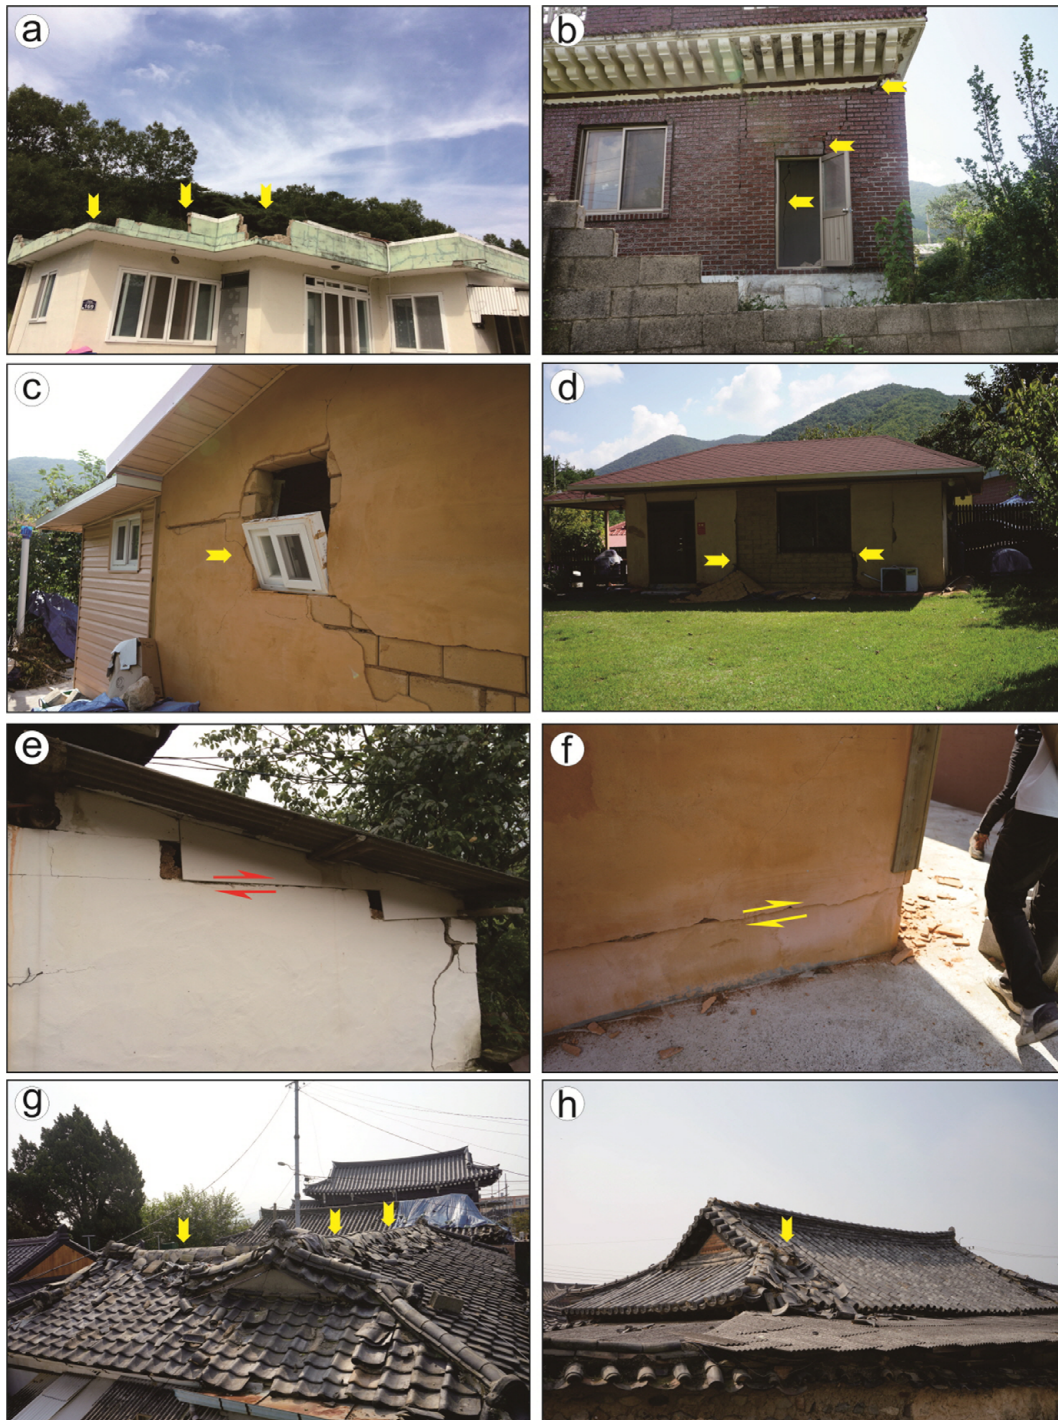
Photographs of damages with various styles of building and house associated with the 2016 Gyeongju earthquake. (a) Collapsed soft bricks unreinforced and unconfined on the roof of reinforced concrete houses. (b) Cracks and distortions in infill walls with clay bricks between reinforced concrete pillars, showing no damage to reinforced concrete pillars. (c) Destroyed window and wall of an old house. (d) Damaged wall built of traditional dry grass and clay. (e and f) Photographs of cracks between roofs and walls in unreinforced and unconfined masonry of old houses. These cracks between walls and roofs are similar to shear fractures. (g and h) Photographs of collapsed lightweight roof tiles of old houses. These lightweight roof tiles exhibit very weak resistance to earthquake shaking because clay was used as the adhesive.
